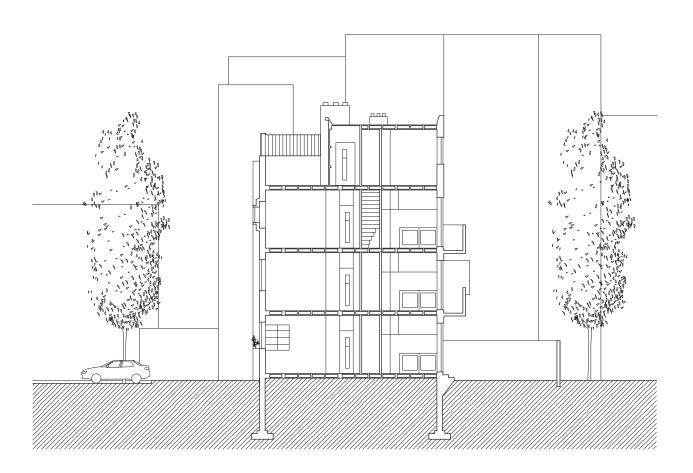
Section of the building on Pieter Lodewijk Takstraat 1:200
